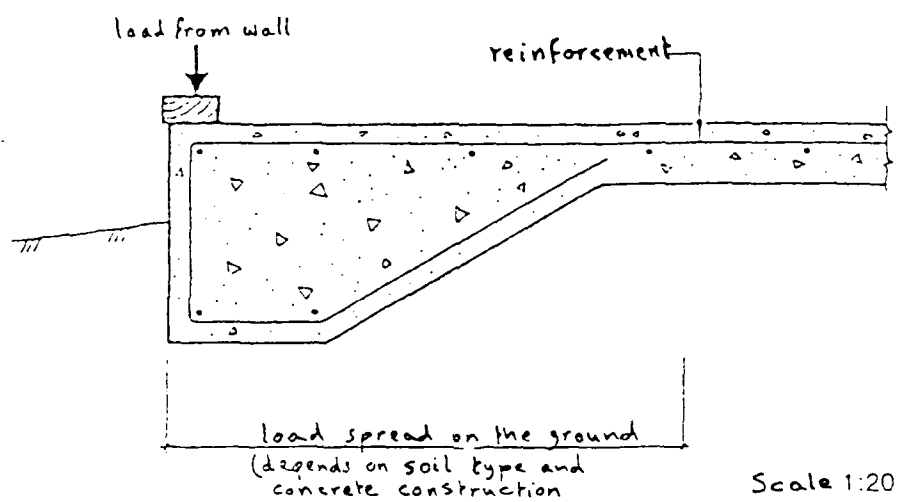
If the foundation and slab are cast as one unit and reinforced, they will act together and distribute the wall loading over a larger breadth on wet ground.
